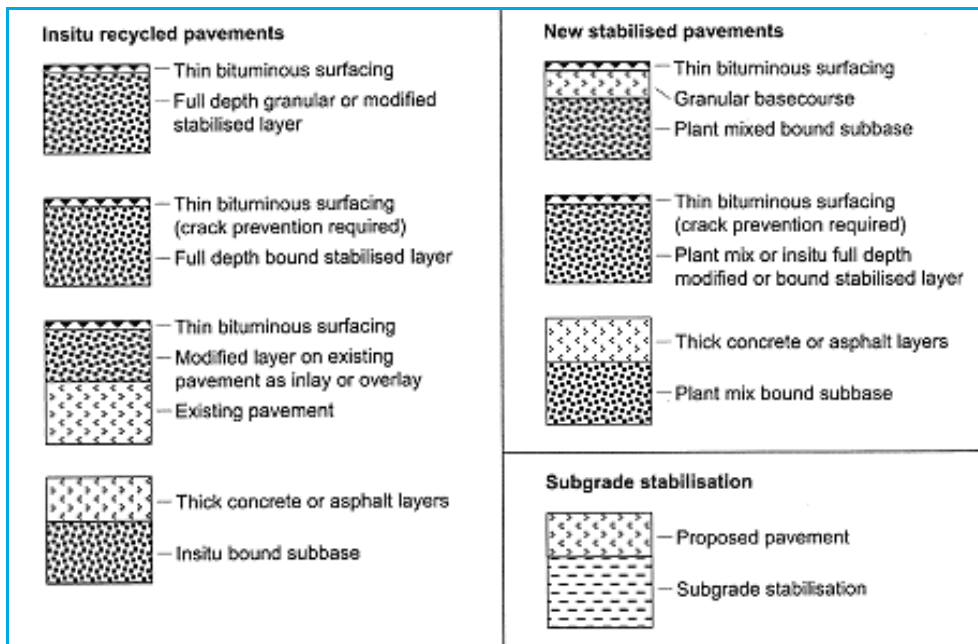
Typical configurations incorporating stabilised pavement layers and subgrades (Austroads 2006).
